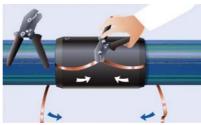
Removing the conductive strip coatings and connecting using the egeplast DCT hand riveter
